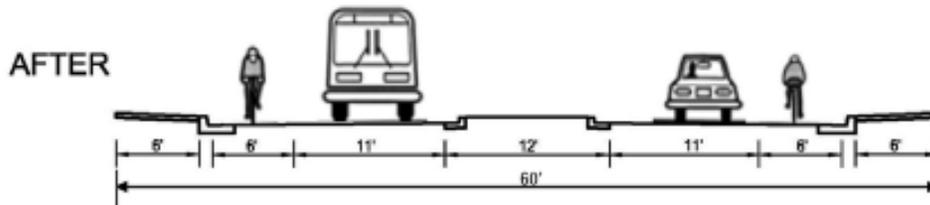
Zuni Rd. Corridor Proposed Cross Section
